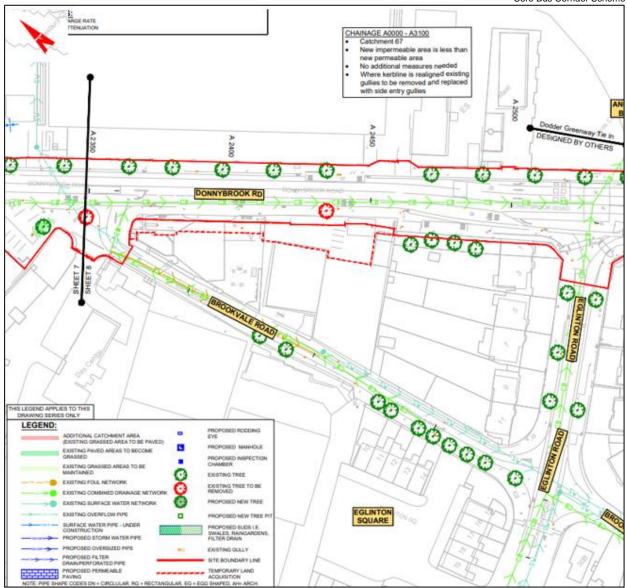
Extract from Proposed Surface Water Drainage Works Drawings (Sheet 08)
